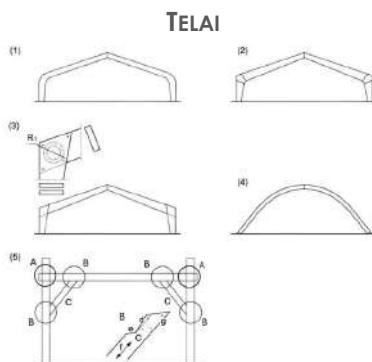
Timber frames addressed: 1) frames with relatively thin lamellas (glued), 2) finger joint (glued) connections, 3) dowelled connections, 4) arches, 5) traditional frames
